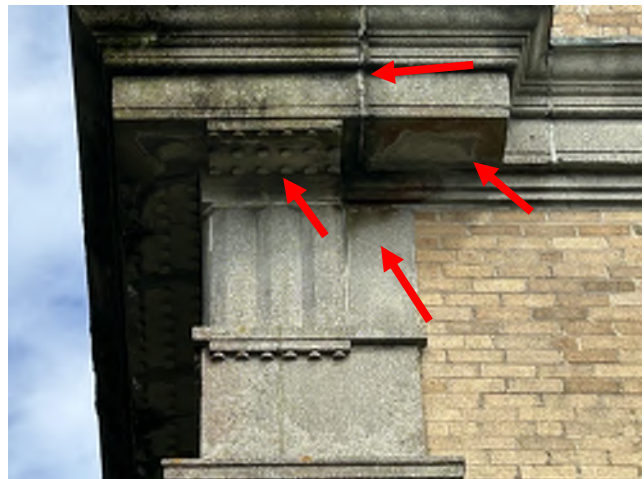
Deteriorated mortar in precast joints, cracked and stained precast elements were observed.
